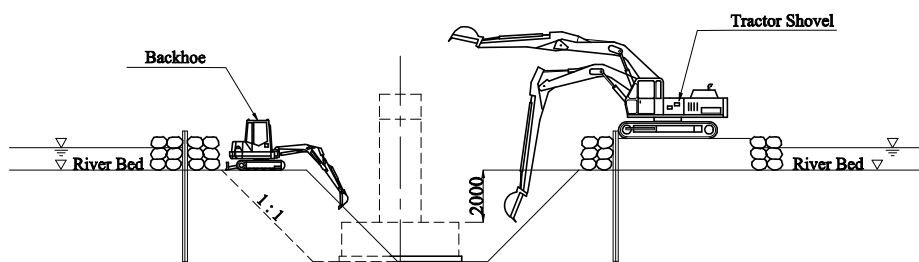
Excavation and Leveling Concrete for Substructure
